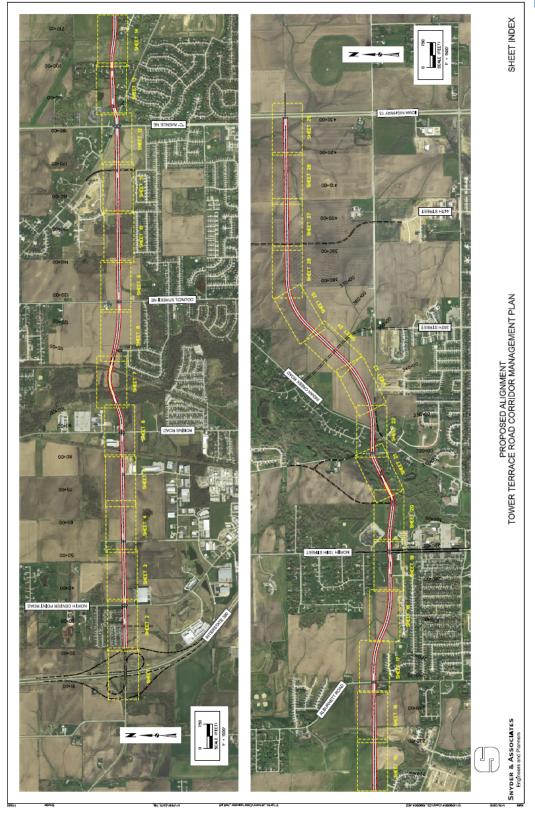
Full Alignment from the Tower Terrace Road Corridor Management Plan
